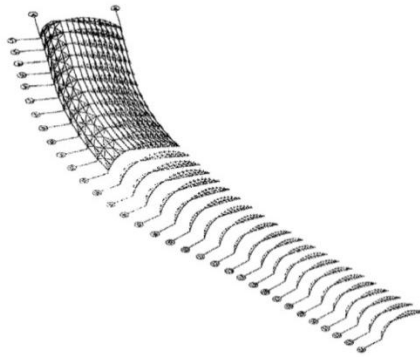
42. Structural schema, Channel Tunnel Railway Terminal, London, UK, Nicholas Grimshaw and Partners (Source: Kolarevic, 2009)
